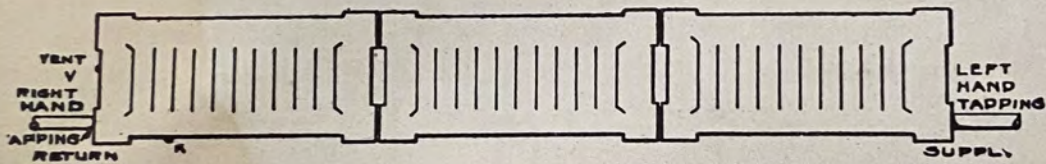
Assembled Three Horizontal Sections in Single Tier One and Two-pipe Steam.
